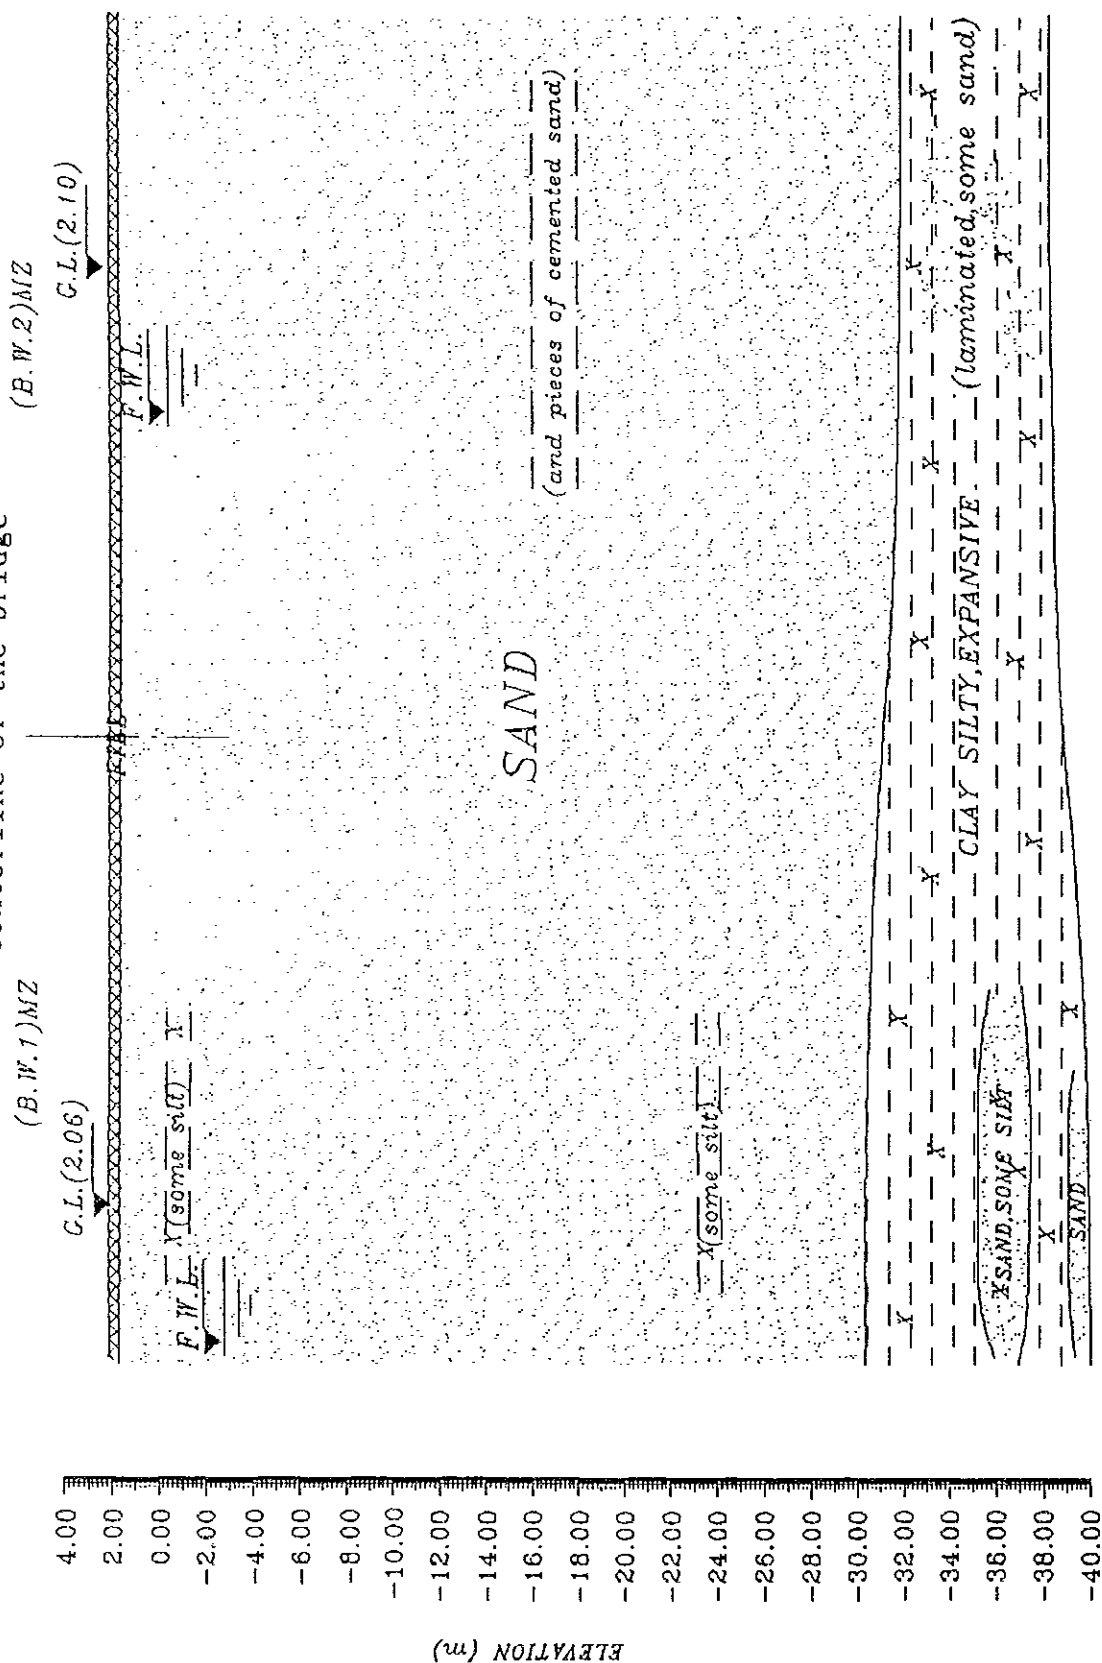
Simplified Longitudinal Geotechnical Section
